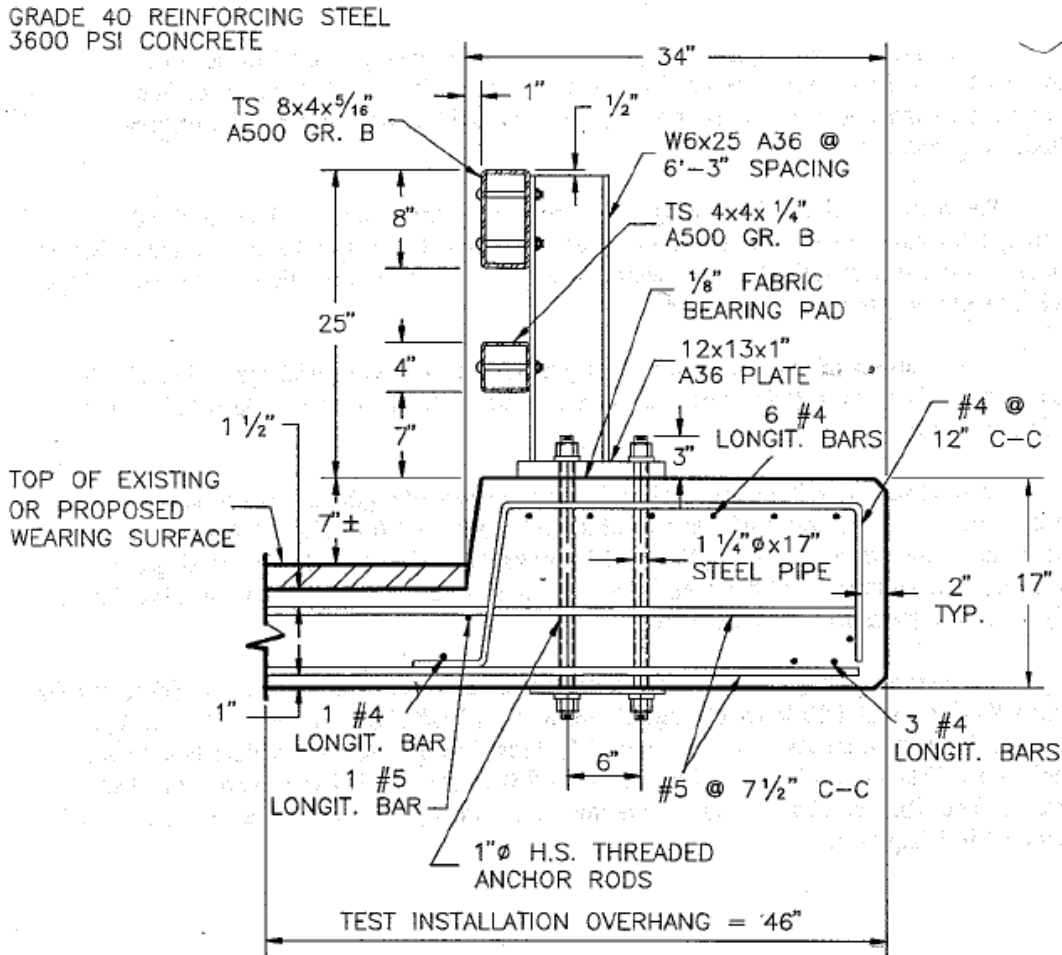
Cross Section of Illinois 2399-1 Bridge Railing
